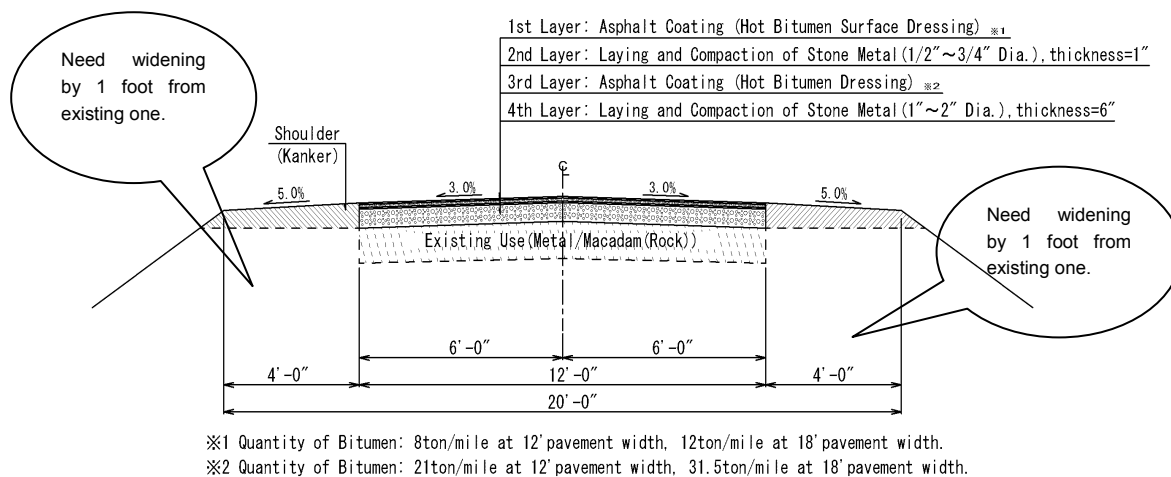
Typical Cross Section of Asphalt Pavement (Rural Road)
